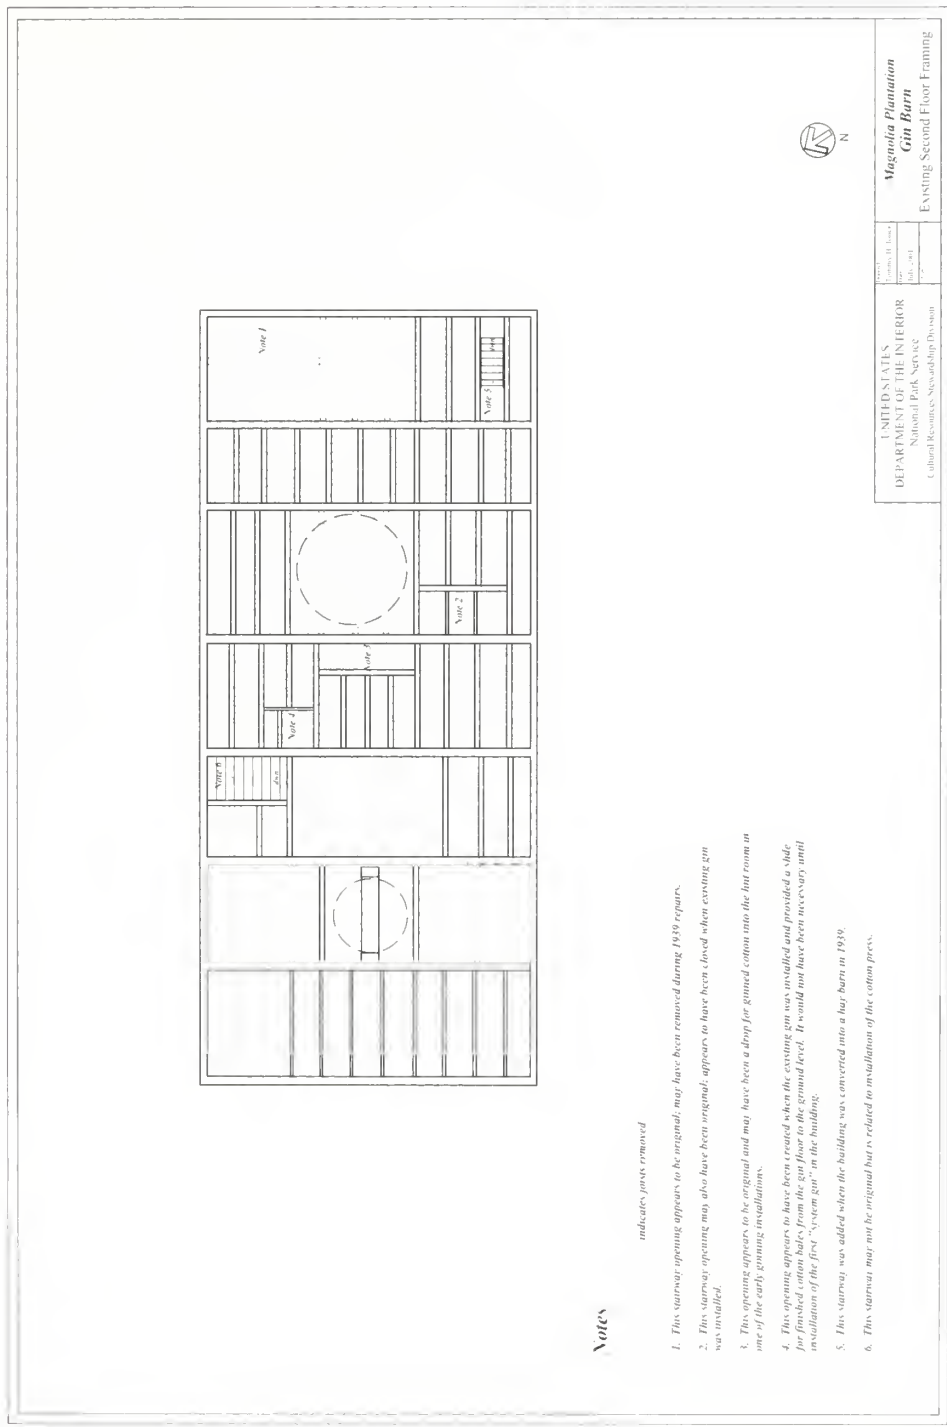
Plan of existing second floor framing. (NPS-SERO-CRS, 2001)
